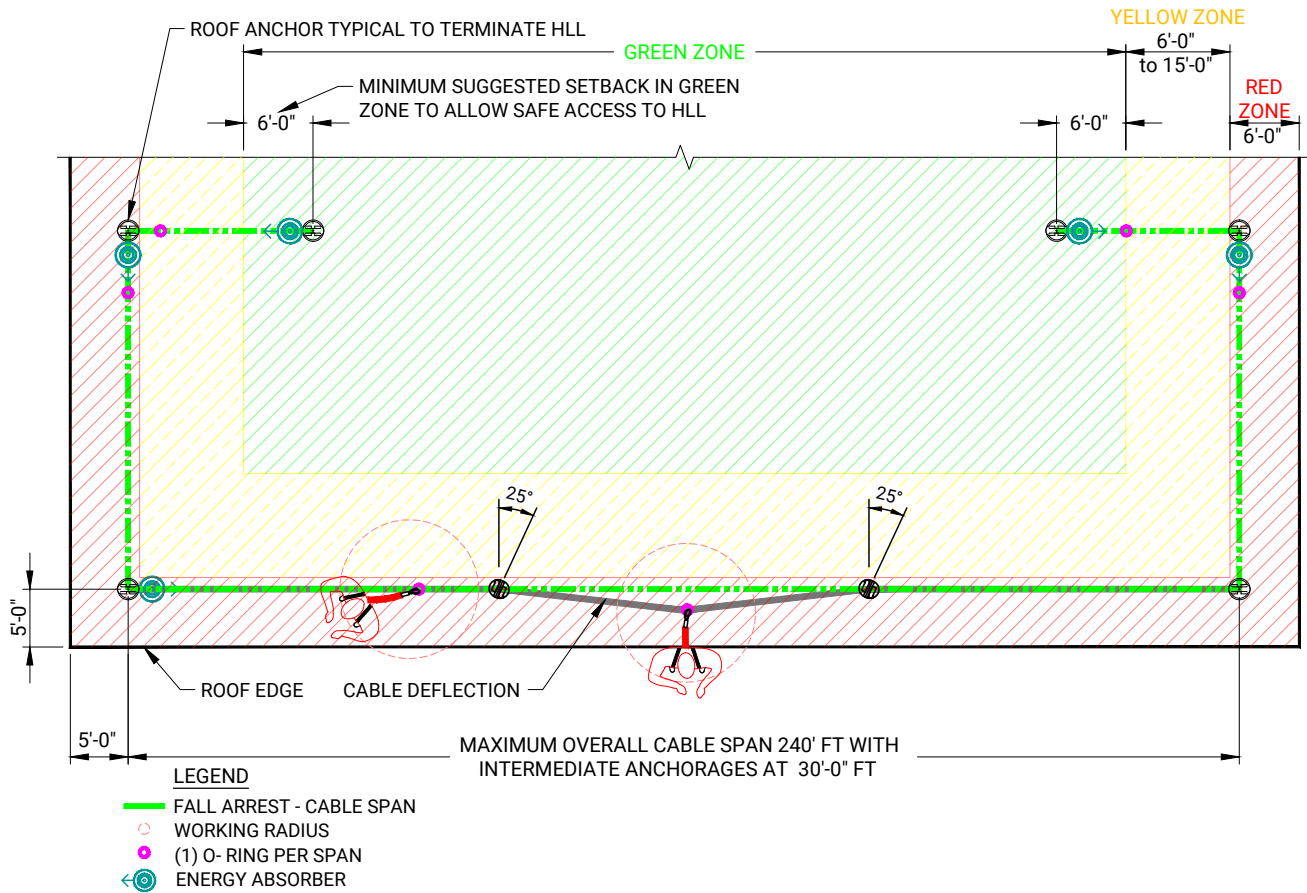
plan view fall arrest system using pass-through anchor eyes for two workers.
